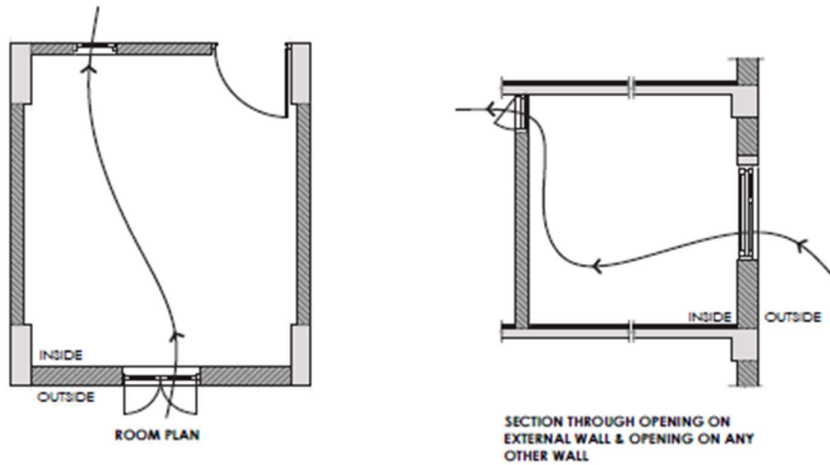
Openings on adjacent or opposite external walls for cross ventilation (Guideline)
